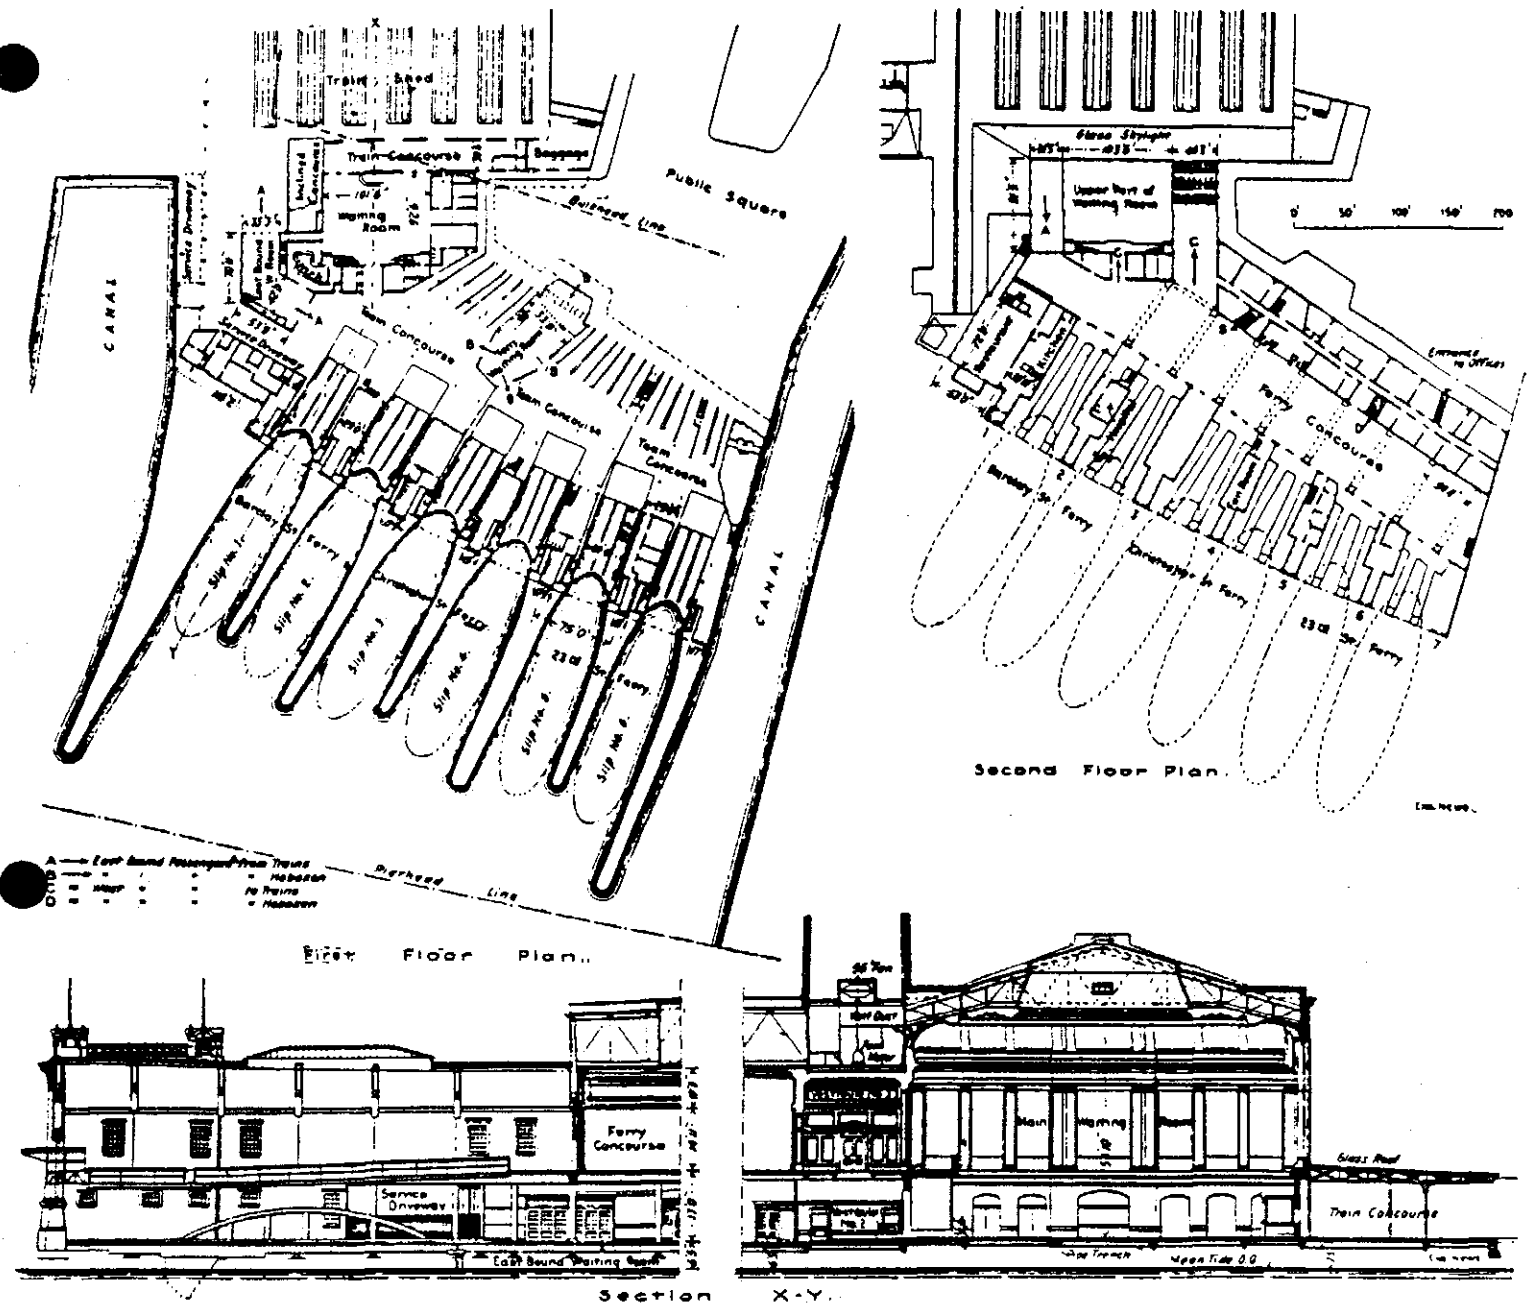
FIRST AND SECOND FLOOR PLANS, AND LONGITUDINAL SECTION; LACKAWANNA TERMINAL STATION AT HOBOKEN, N. J.
